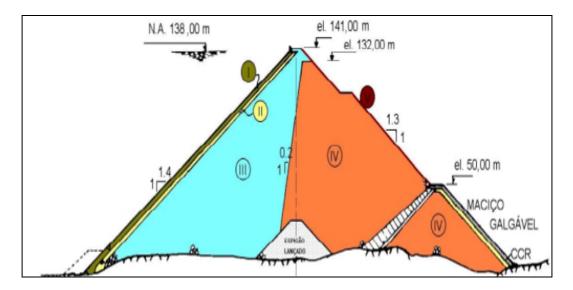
Main cross-section of Xingó Dam (Souza, 2007)
